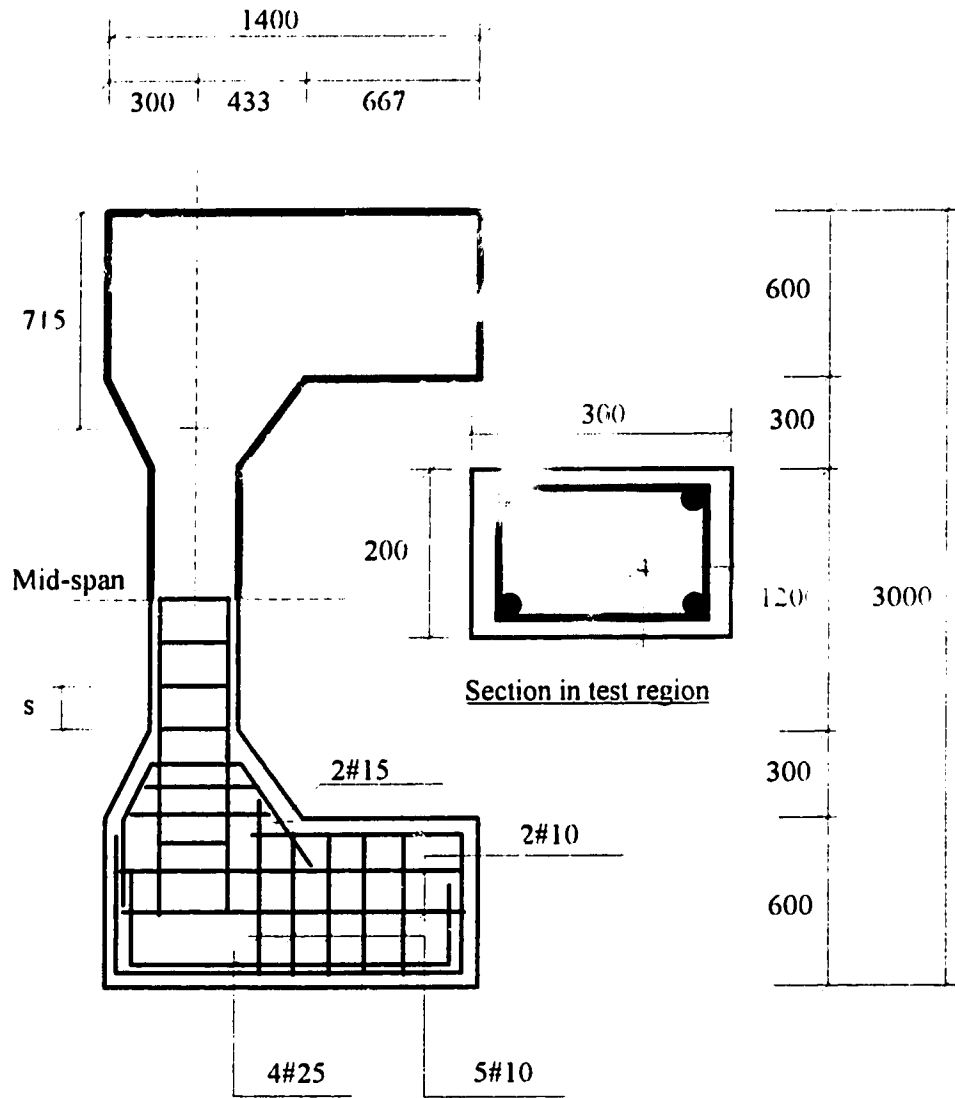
Elevation and cross-sectional view of rectangular column specimens
